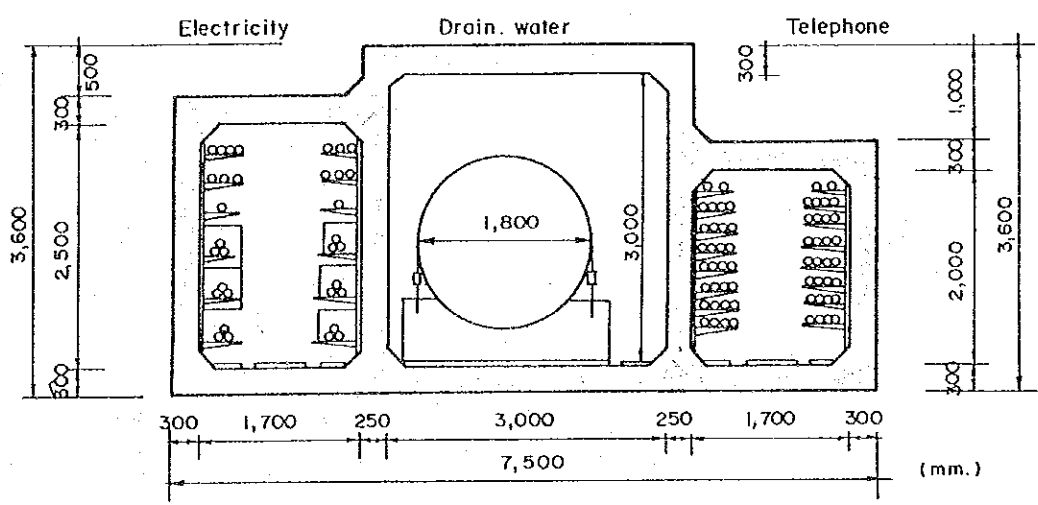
Typical Cross section of Trunk Line Common Duct
